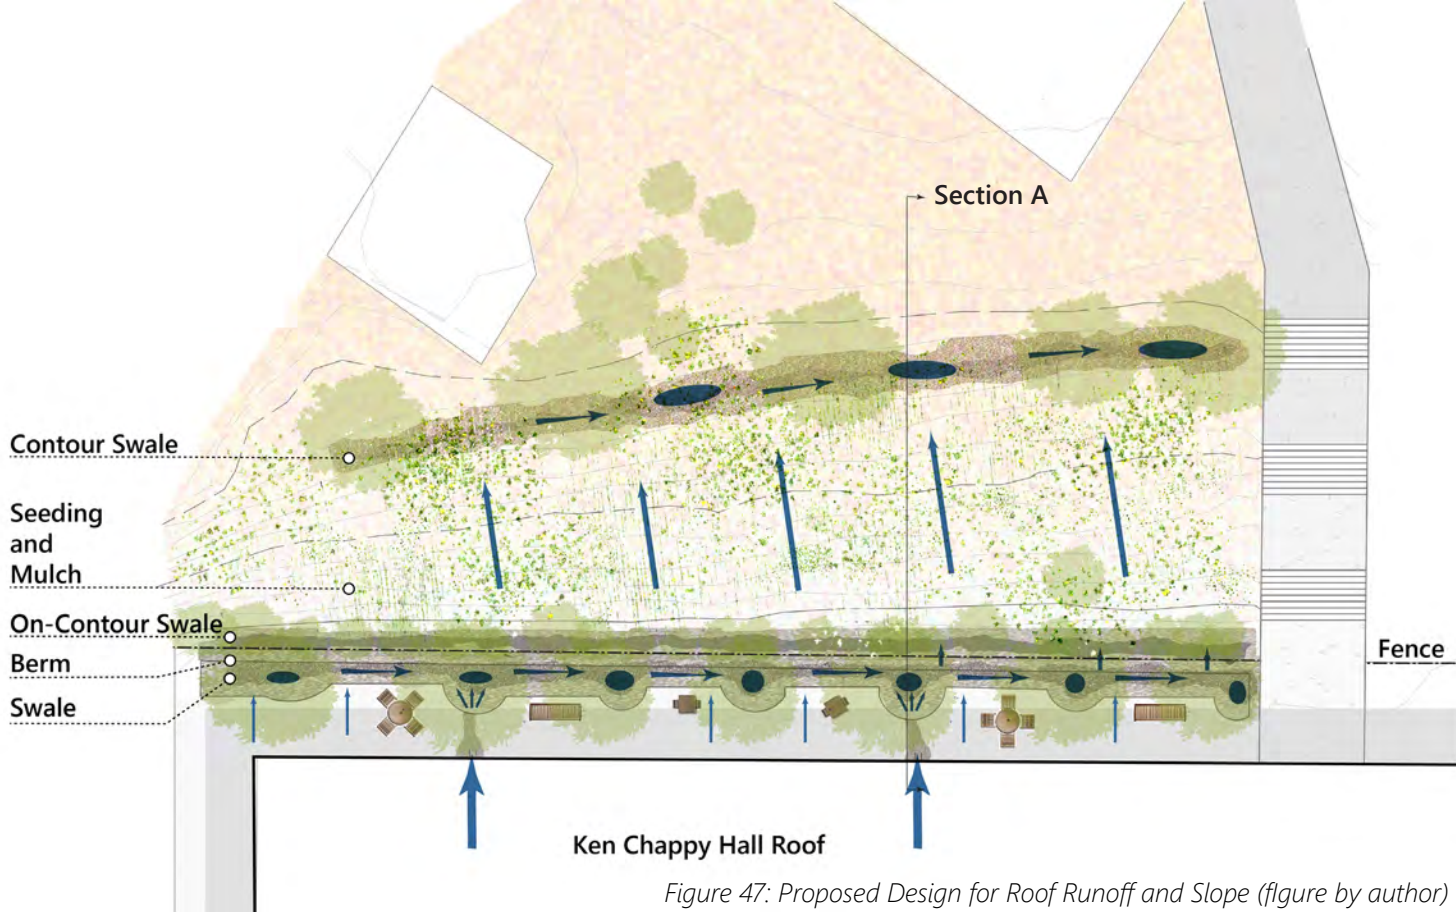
Proposed Design for Roof Runoff and Slope (figure by author)
